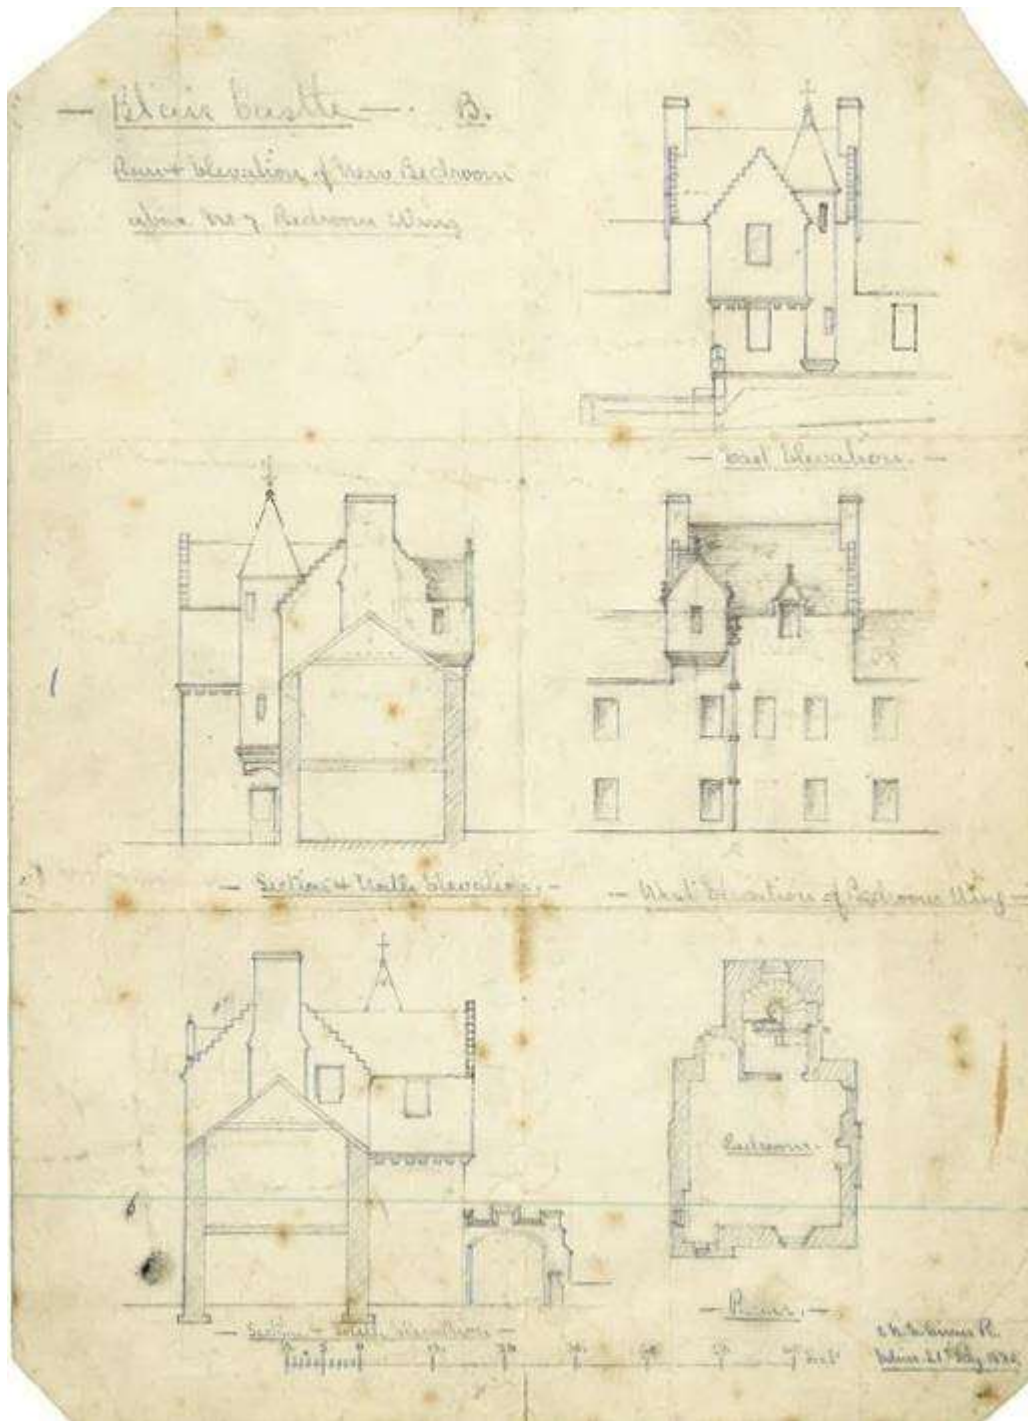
James C Walker drawings showing extension & gate, much as built. BCA
